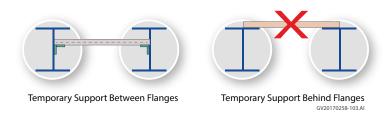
Preferred method of temporary lagging installation. *Installing lagging between the soldier piles will reduce the potential of ground movement behind the wall.
